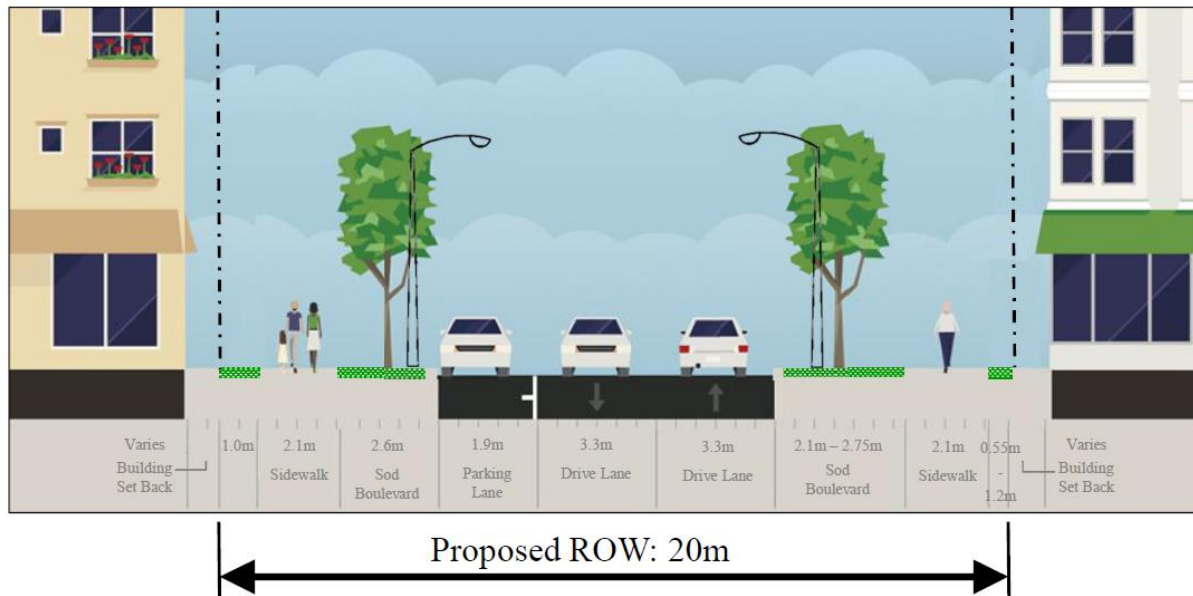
Typical Section - Reconstruct existing street (Barberry Place to Rean Drive)
